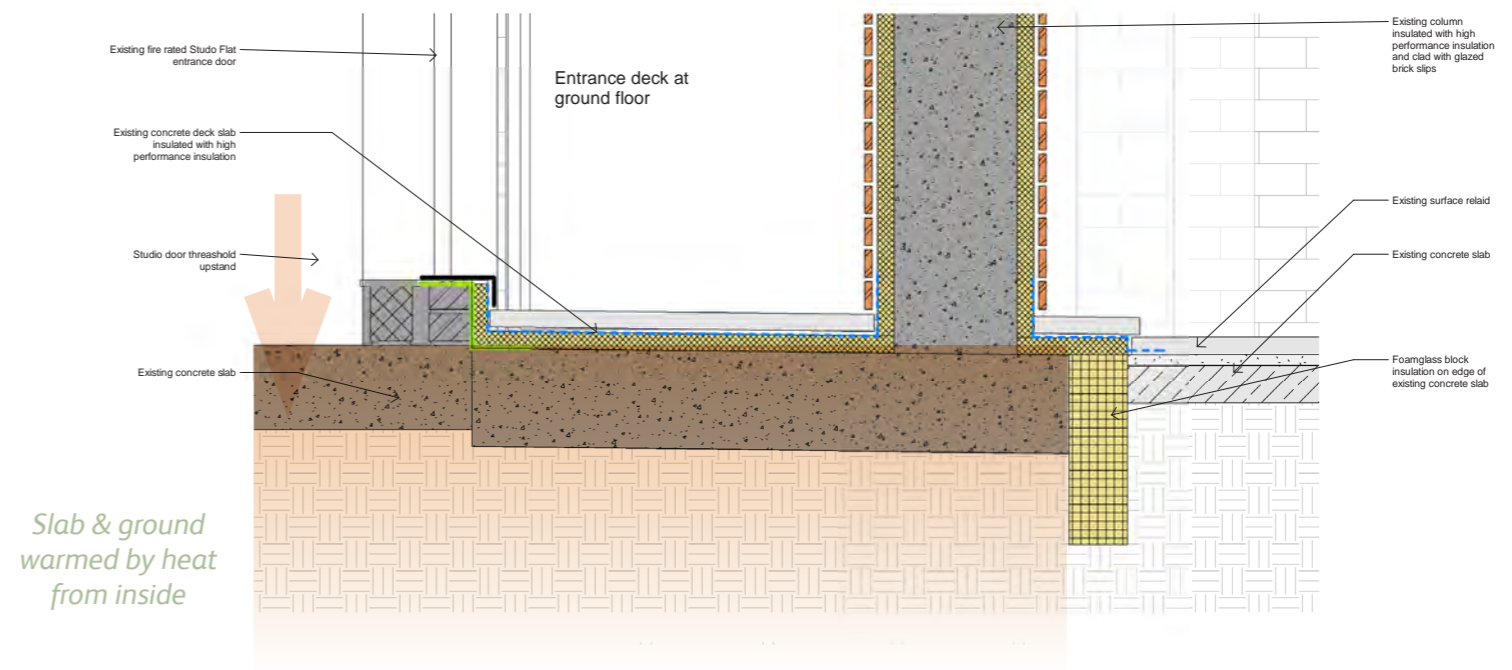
Insulation of Ground Floor Slab - Deck Side
